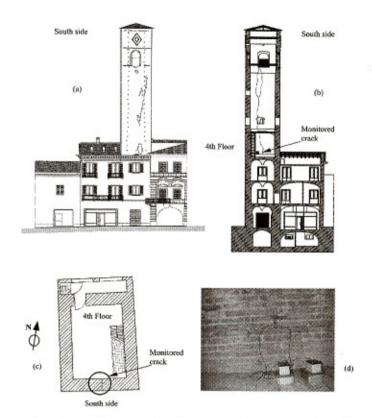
Torre Astesiano: (a) elevation of the tower, notice the presence of the main crack in the upper part of the tower; (b) cross section of the tower; (c) plan of the zone monitored; and (d) photograph taken during the monitoring of the tip of the main crack
